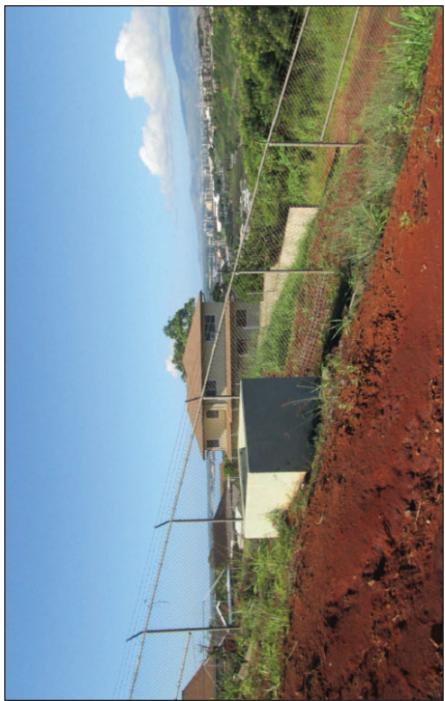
Above ground drainage vault near western property boundary. Source: Limtiaco Consulting Group 2022.
